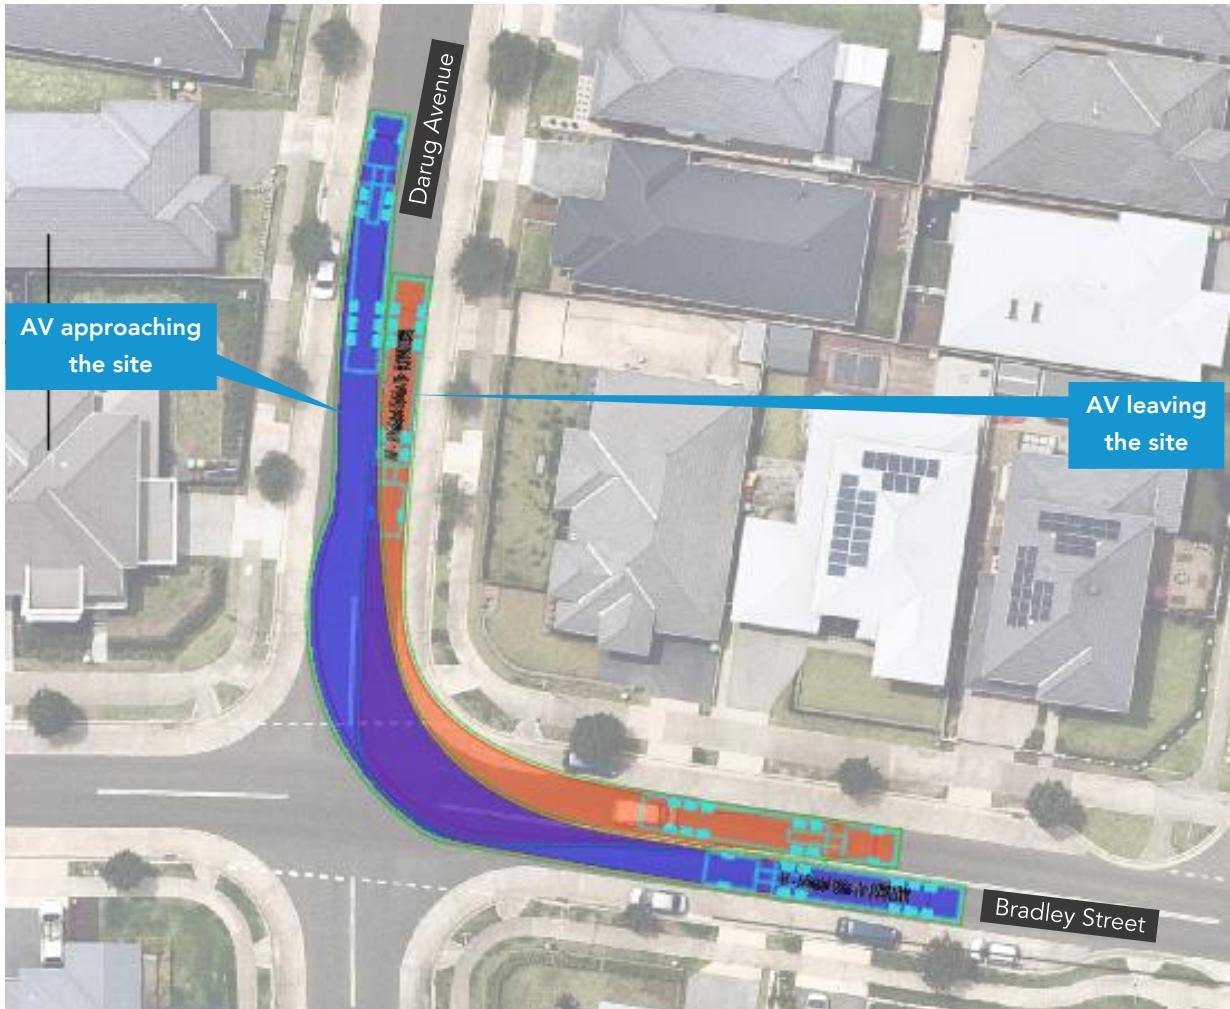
AV at the Bradley Street / Darug Avenue intersection
